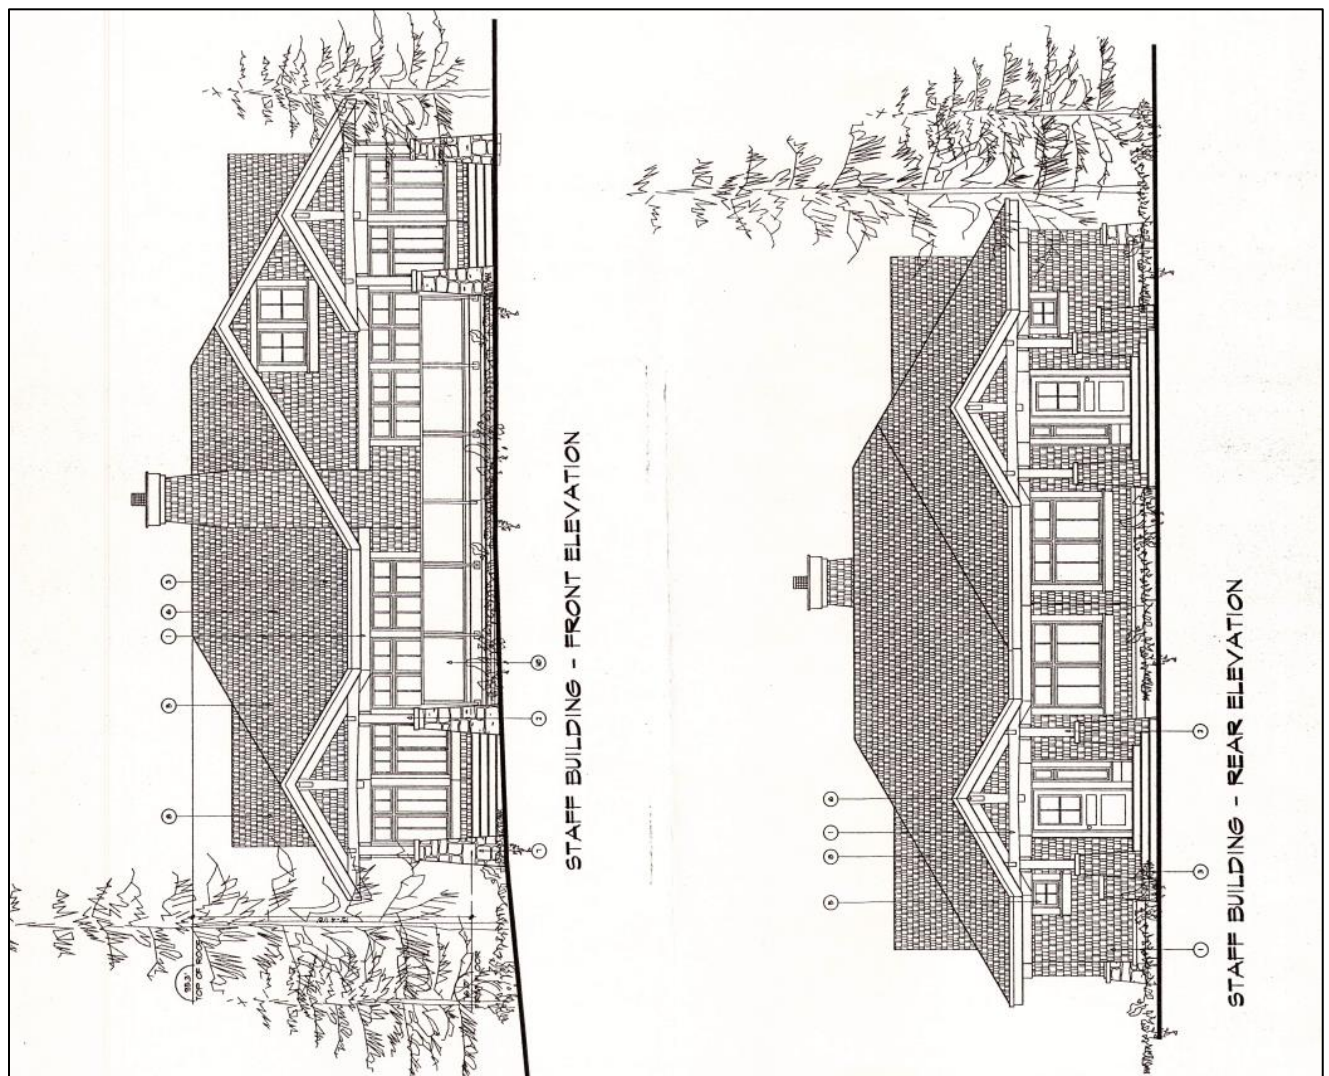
Original planned staff accommodation building. Note consistency with form and character of the rest of the resort development.
